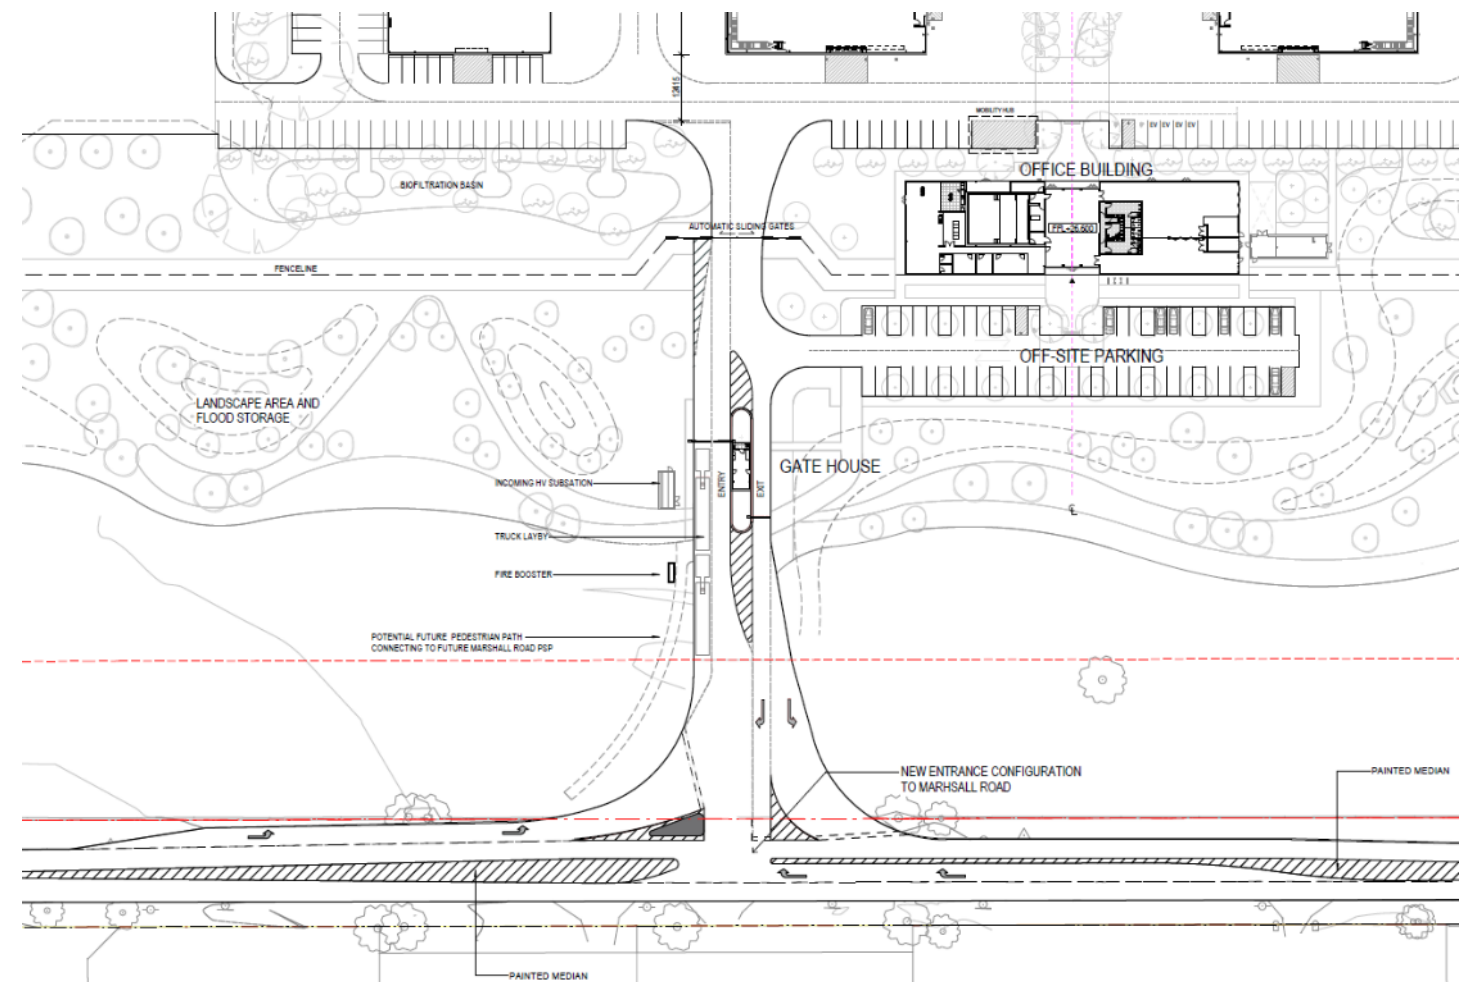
Proposed interim site access with combined Malaga Site entry and exit road layout and existing single lane Marshall Road arrangement (source: Hassell, March 2023)
